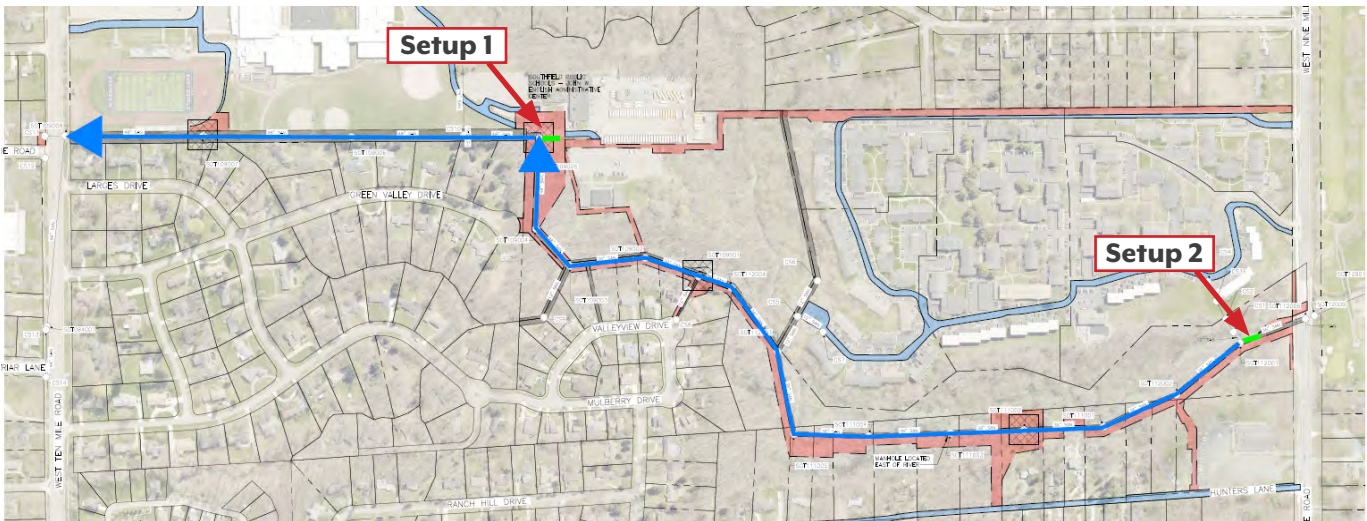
SAK's long-reach cleaning and televising plan requires only two setups.
